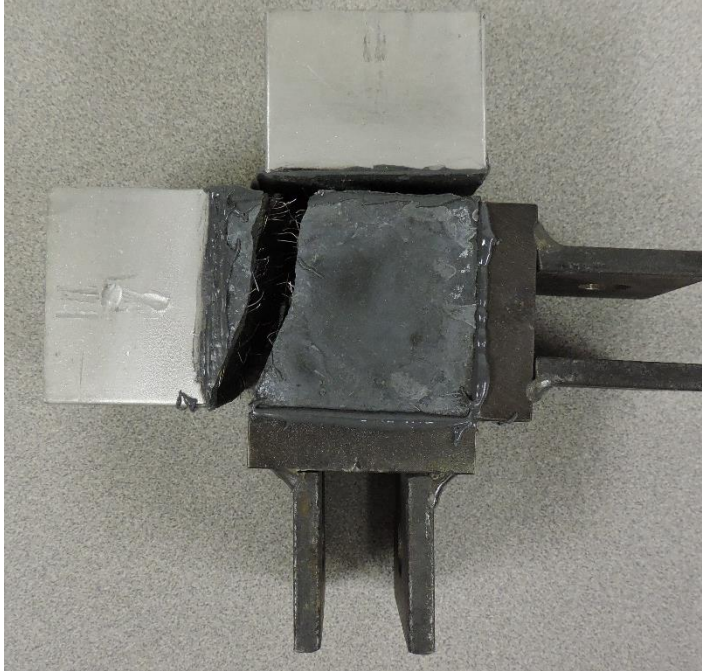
Failed TT specimen with 4% fibers subjected to proportional loading
